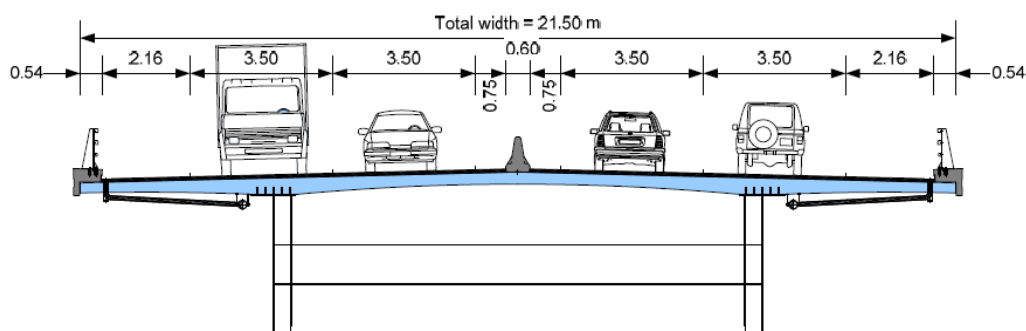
Cross-section of the deck with the road platform data (source: OPTIBRI [5]).
